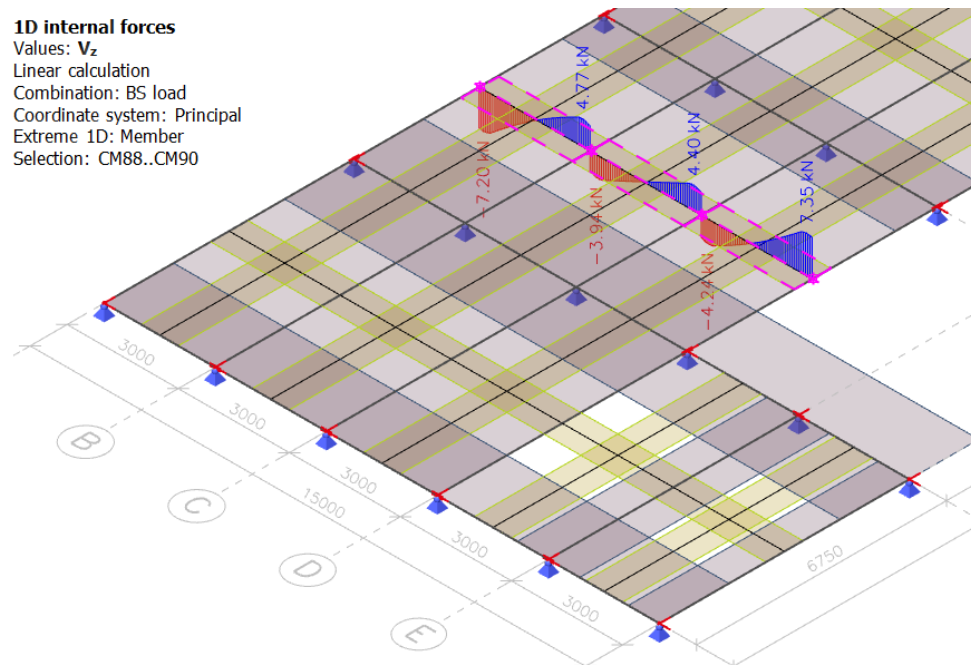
Slab Supported by Flexible Beam with Maximum Shear Slightly Offset from the Supporting Beam.
